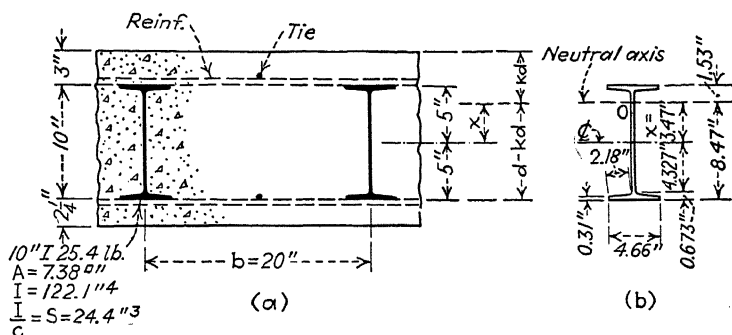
Floor of Lincoln Tunnel, New York City.
